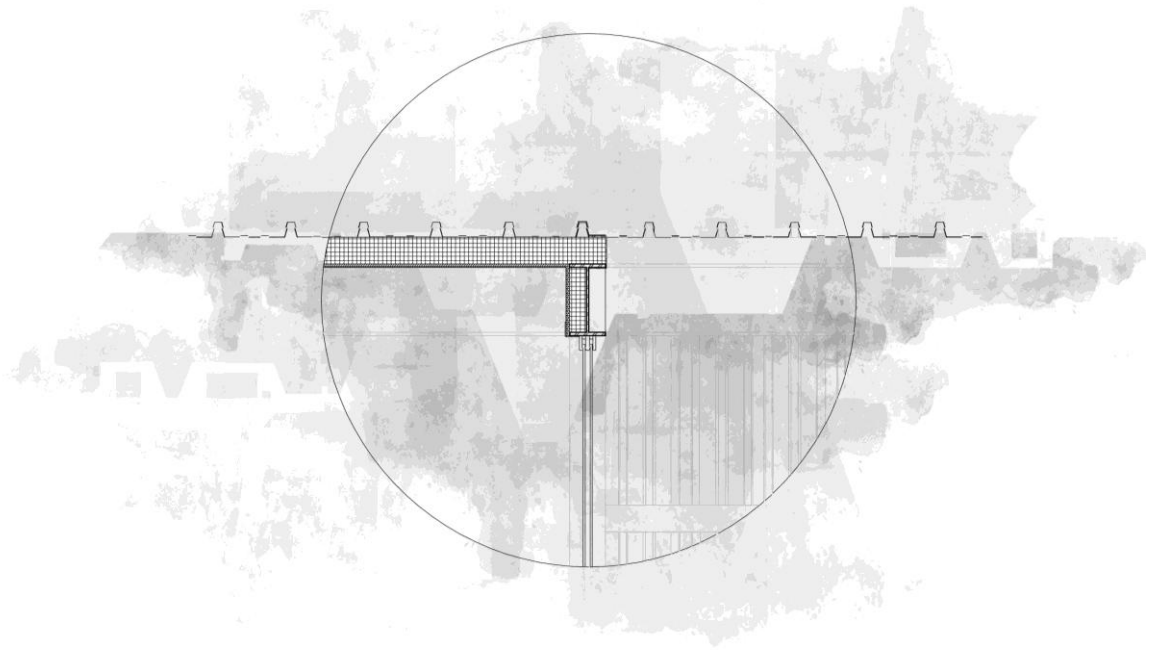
DETAIL A: DETAIL illumination of (TECTONIC) ROOF DETAIL. (Author, 2015).
